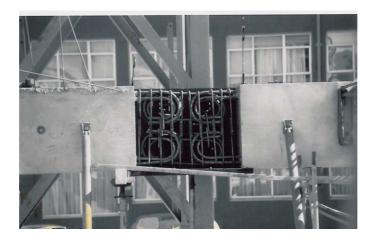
Example of a connection with drop-in-double hooked bar in a building in New Zealand (Courtesy of J. Restrepo)
